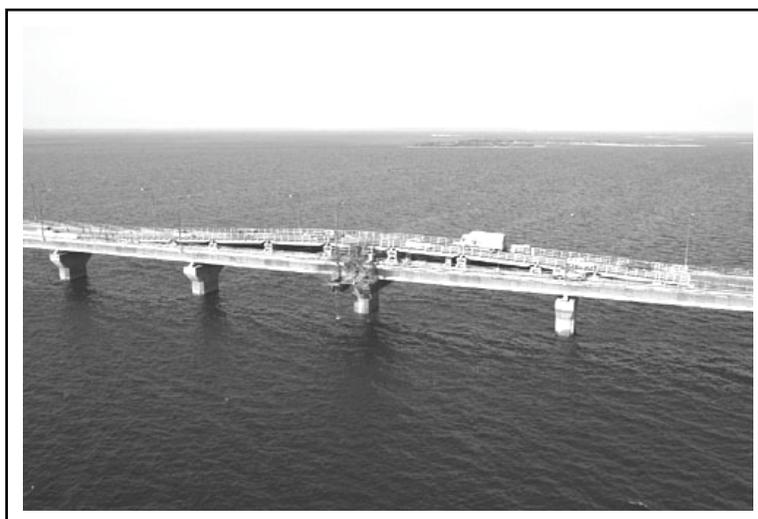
Mabey & Johnson Midspan Overbridge Erected Over a Damaged Pier (Sweden)
